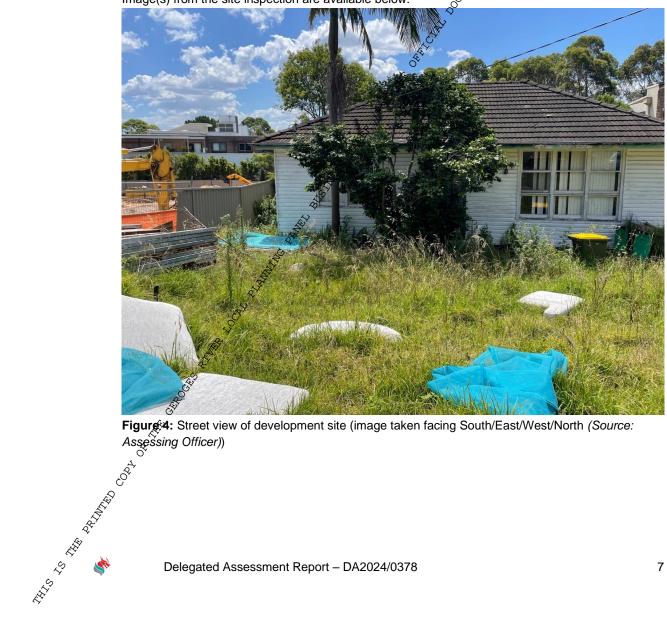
Street view of development site (image taken facing South/East/West/North (Source:
